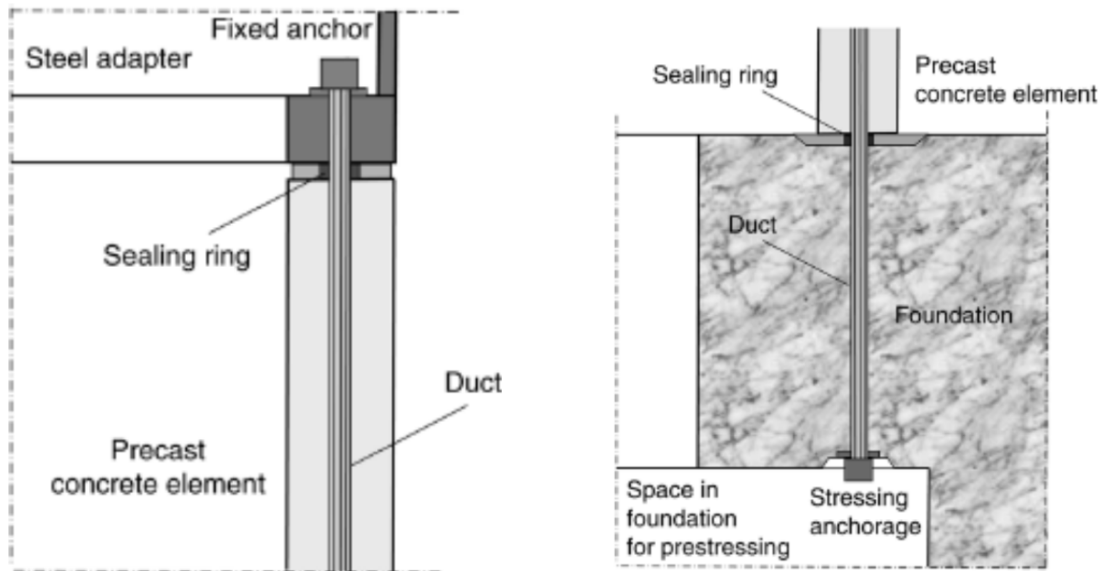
Anchor point for the prestressing cable to the top of the tower, and the foundation [20]
